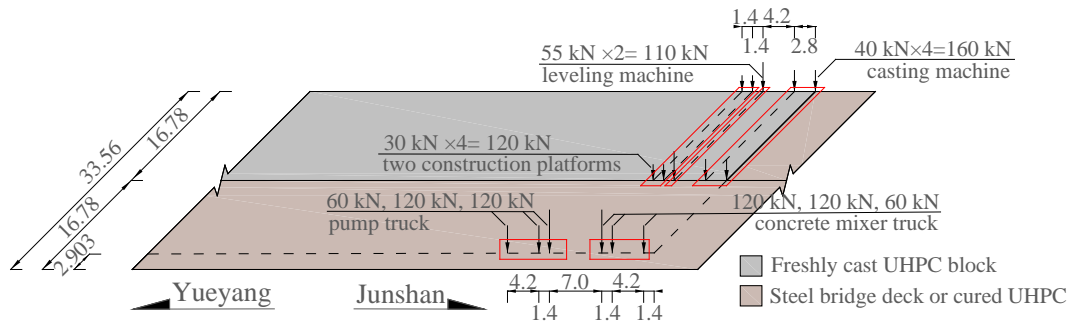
Loads of construction vehicles and construction machines: schematic drawing (unit: m)
